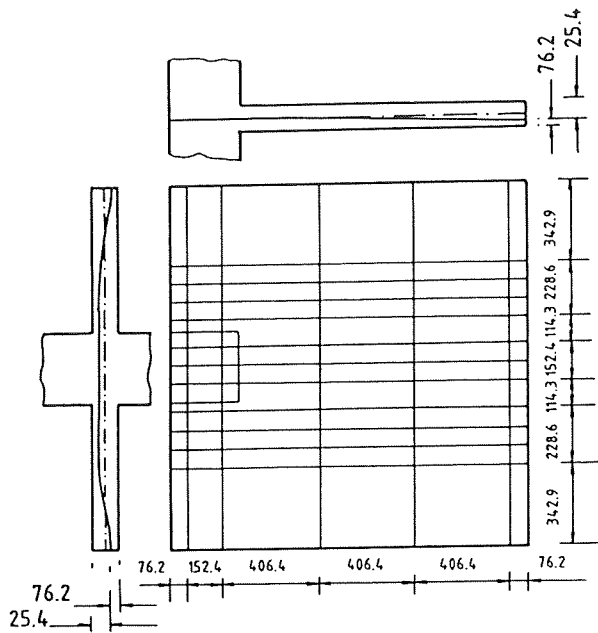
Illinois slab-column connection tests—unbonded tendons.
